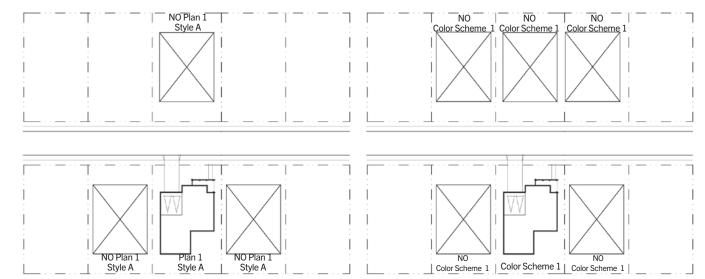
Plan and Elevation Diversity Diagram (SFD)
